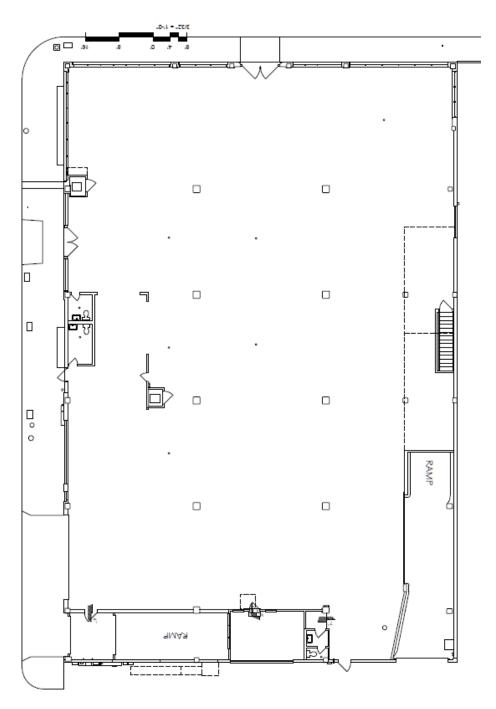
Existing First Floor Plan. Courtesy of Open Studio Architecture. N
